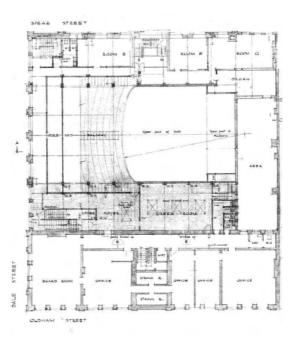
Second floor plan of the reinstated hall. Source: Halliday Meecham.
